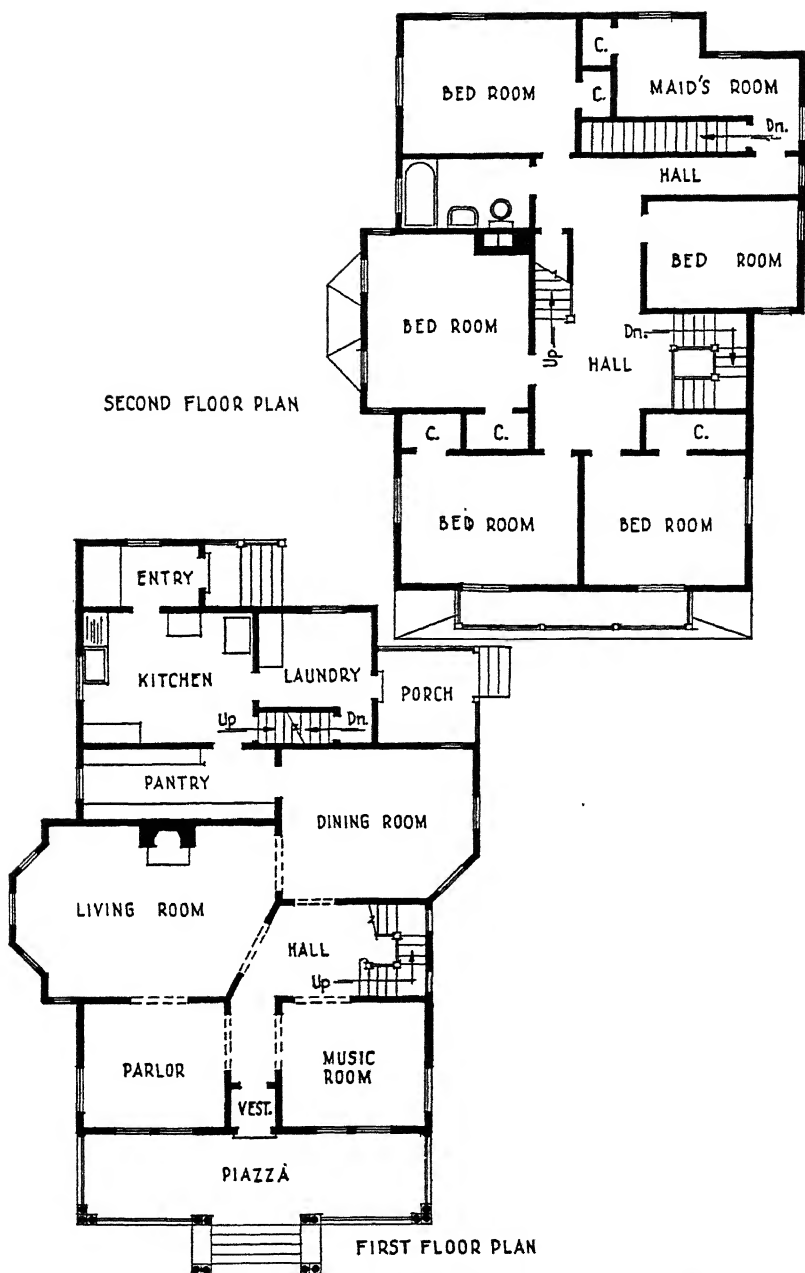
PLAN, AMERICAN "CARPENTER" HOUSE, CIRCA 1900
